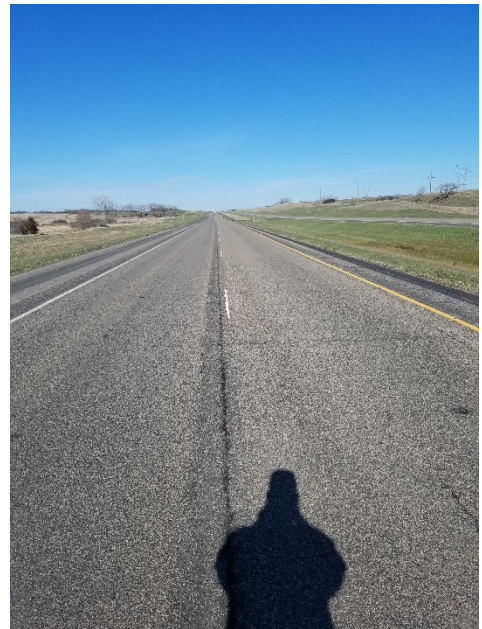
& 8 – Damaged markings at RP 168.0 (Potters Visibead)
